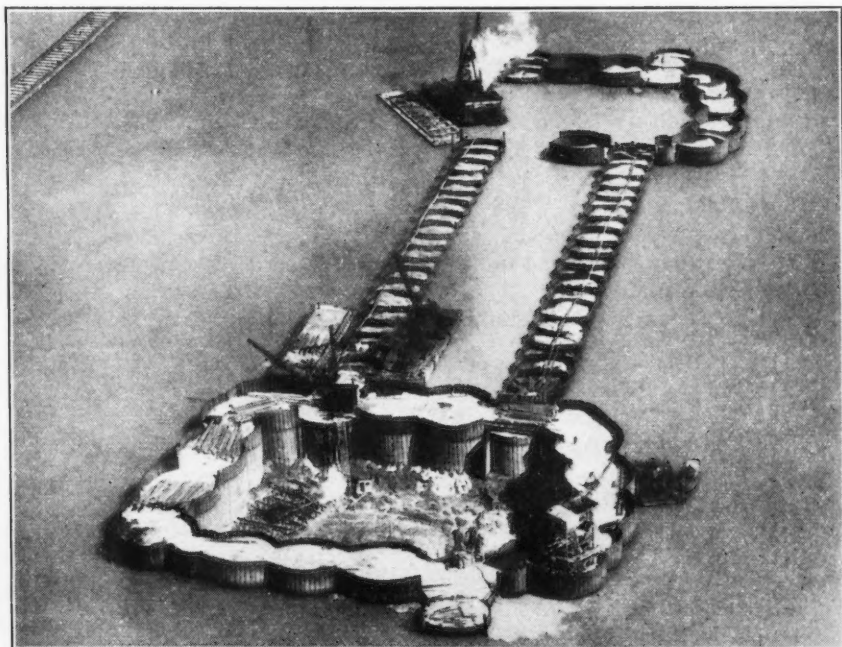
GENERAL VIEW OF WALL CONSTRUCTION AND COFFERDAM FOR CONSTRUCTION OF CONCRETE GATE BLOCK "IN THE DRY"
